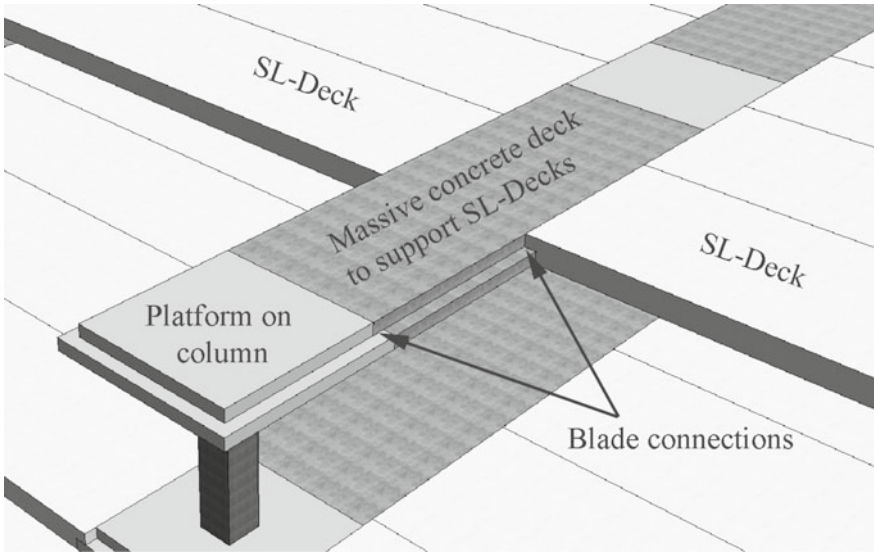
Beamless building consisting of a frame of platforms, columns and massive concrete decks. The frame supports SL-Decks by blade connections
